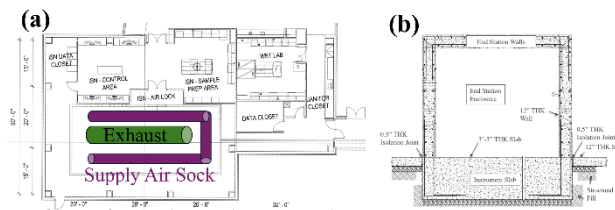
(a) Schematic layout of the ISN satellite building and endstation. (b) Cross-section view of the end station concrete foundation, isolation joint, and walls.
